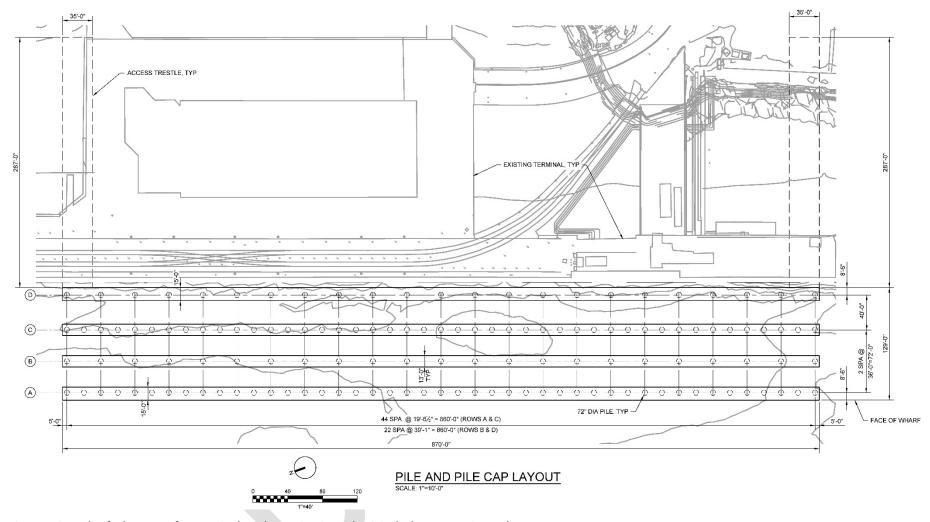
Wharf Pile Layout for Terminal 1: Alternative 2A with 72-inch-diameter Driven Piles
